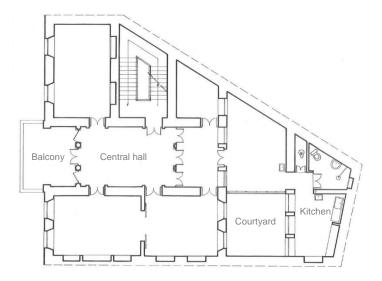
Khan Al-Goumrok first floor plan Source: The author, after David and Hubert, 1982
